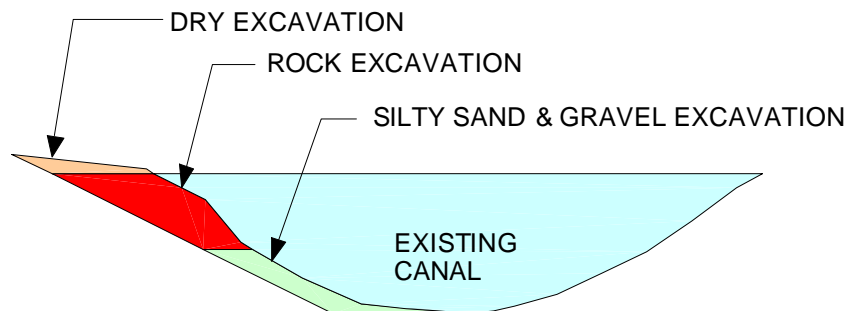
Typical Northeast Pump Station Connector Canal Cross Section
